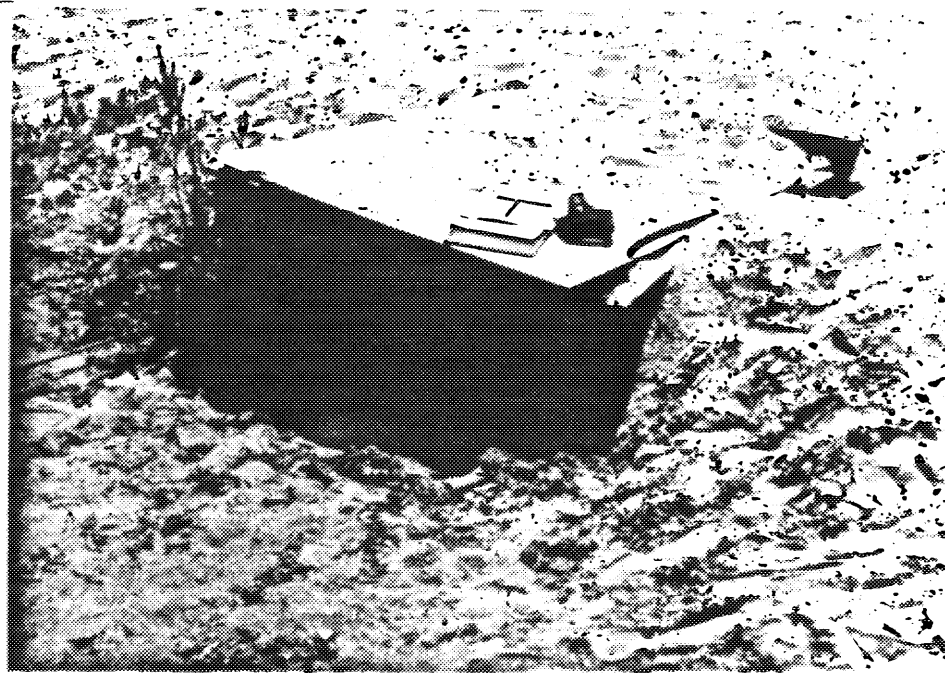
Intake of 3-foot diameter concrete conduit at dam (West Dike).
